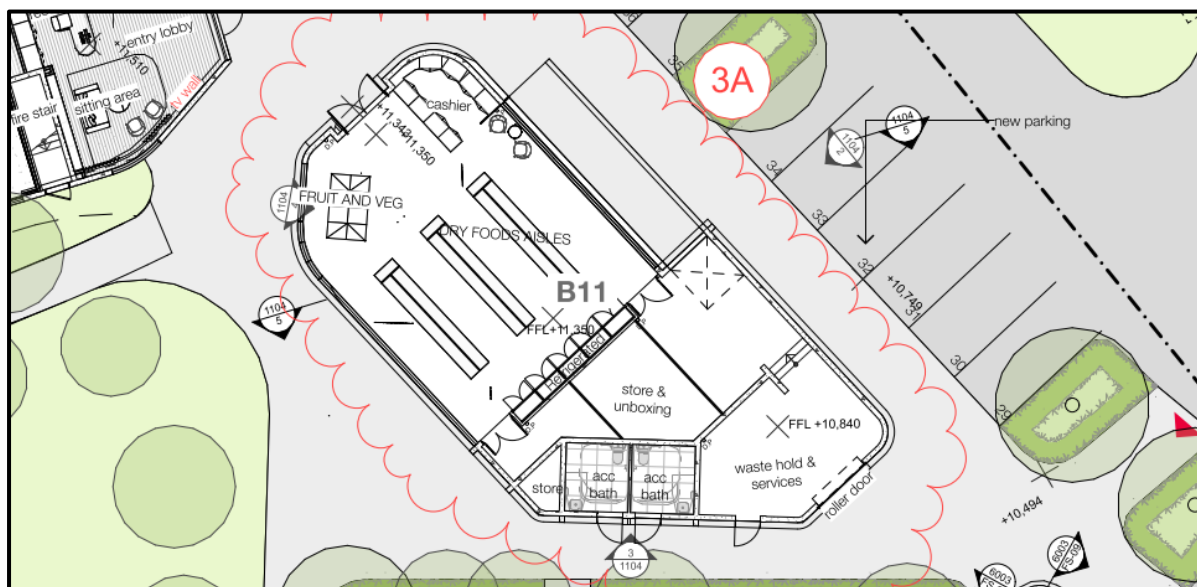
Proposed B11 Ground Floor Plan for Subject Modification C
